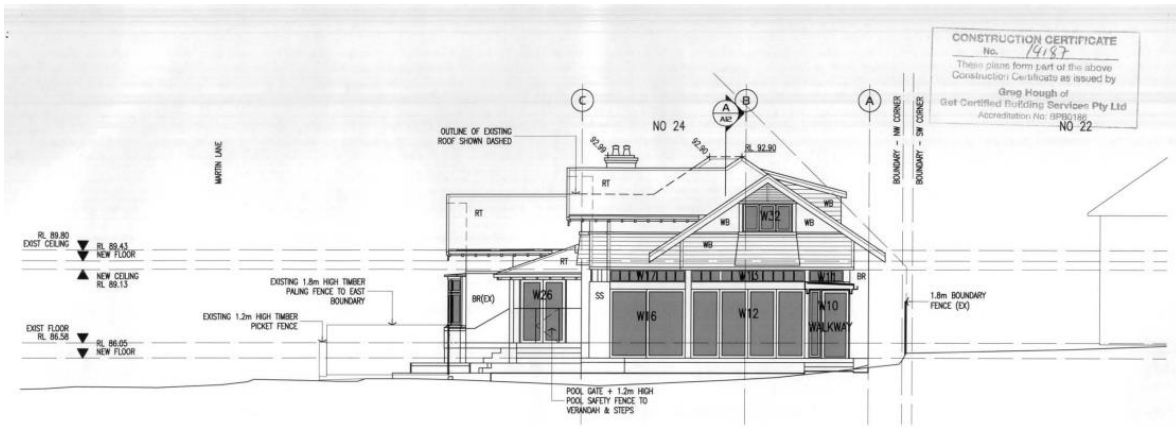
Proposed alterations and additions to first floor of dwelling dated from 2013
